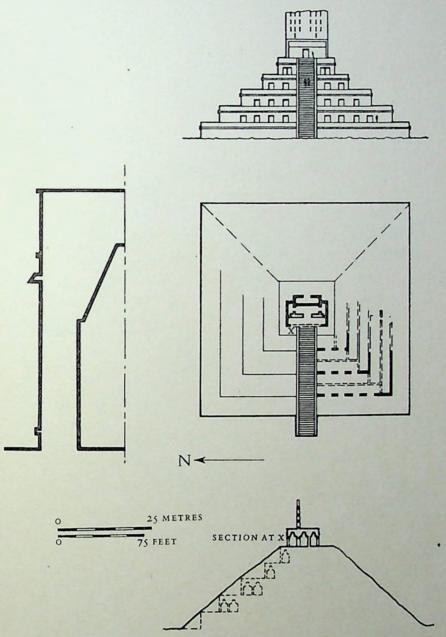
Edzná, main pyramid, seventh-eighth centuries. Elevation, plan, and sections
